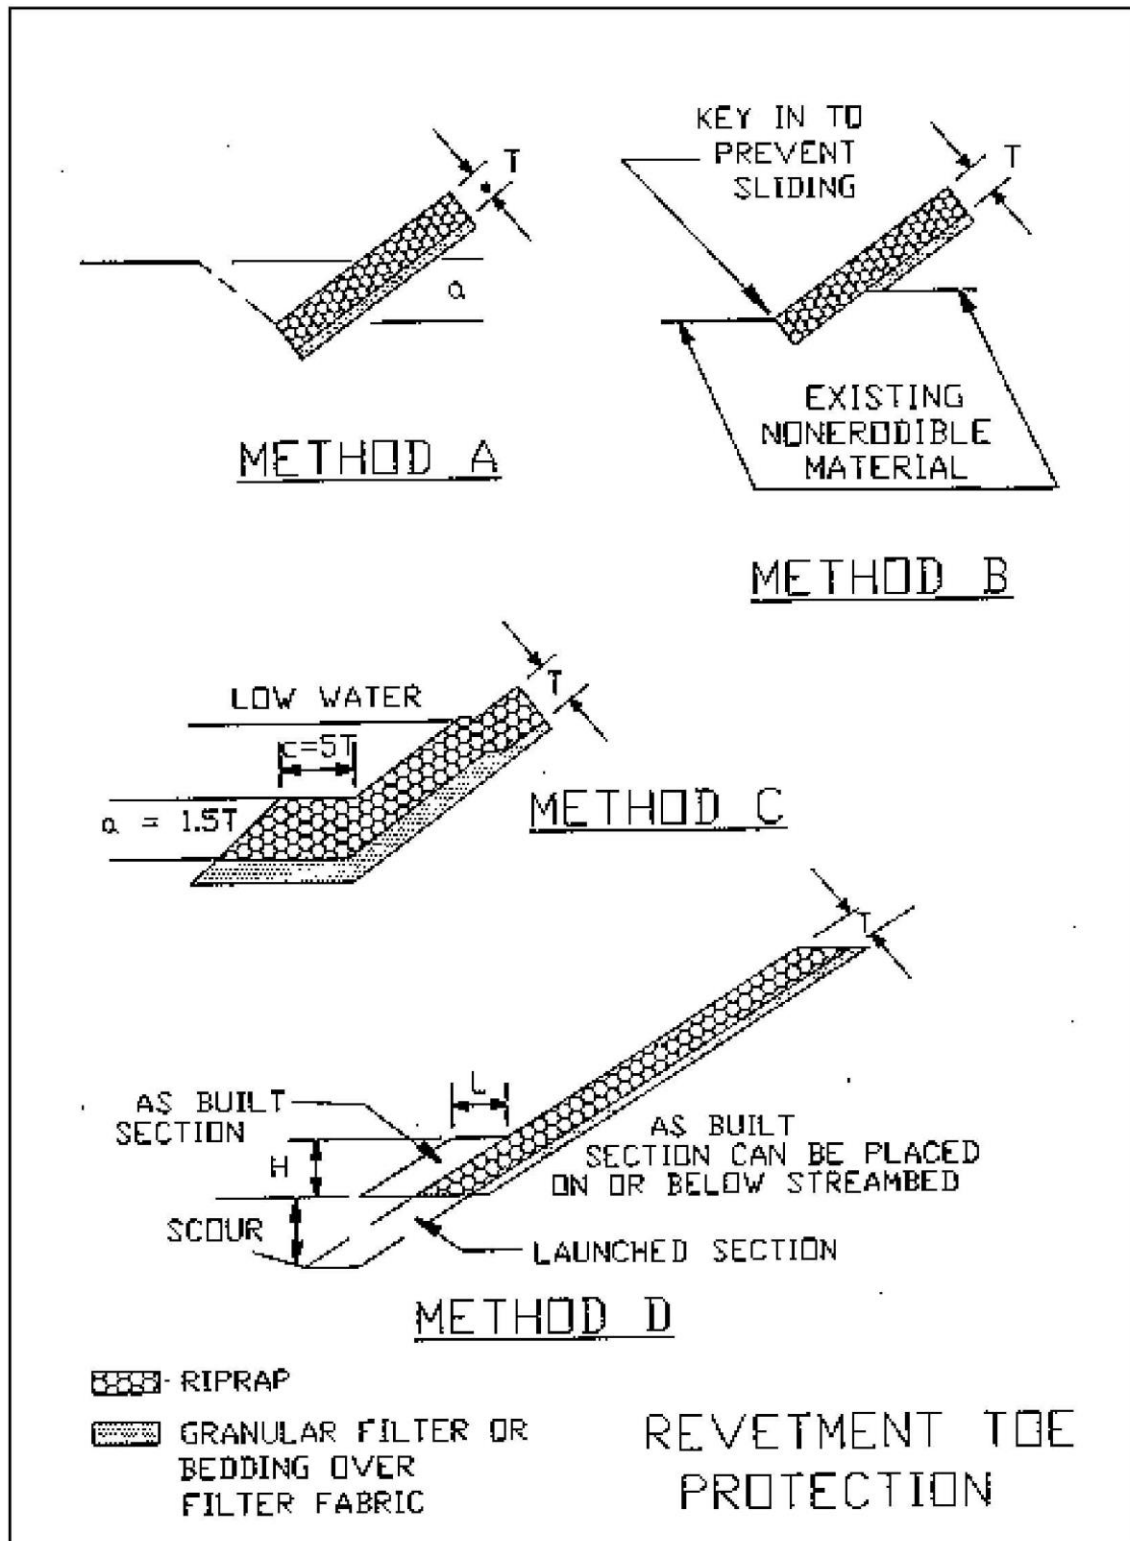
Typical Riprap Design for Revetment Toe Protection
